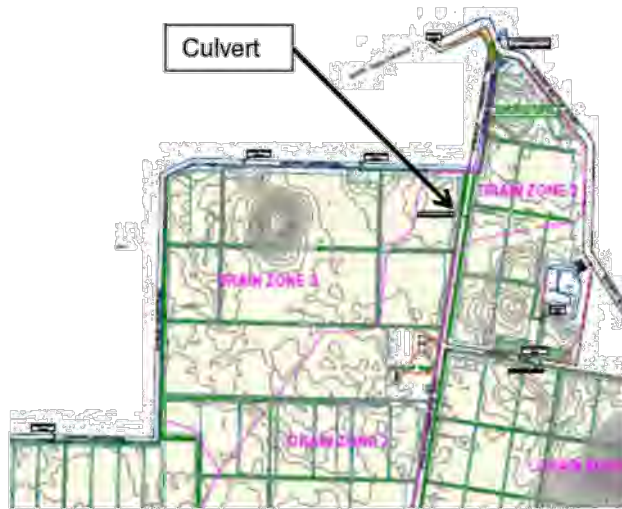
Extract from Surface Drainage Zone Plan (Source: NJC Irrigation Solutions)
